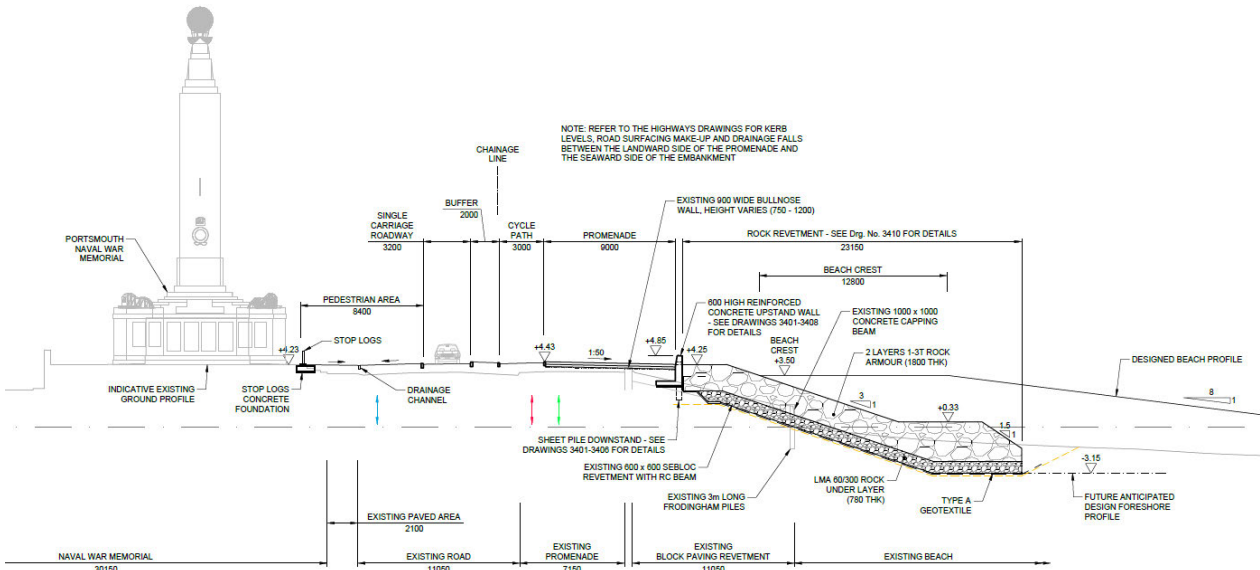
Typical cross-section of the rock revetment at sub-frontage 3.
